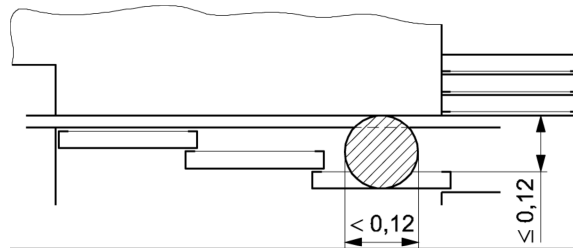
Horizontal sliding carrier and landing doors, not mechanically coupled
